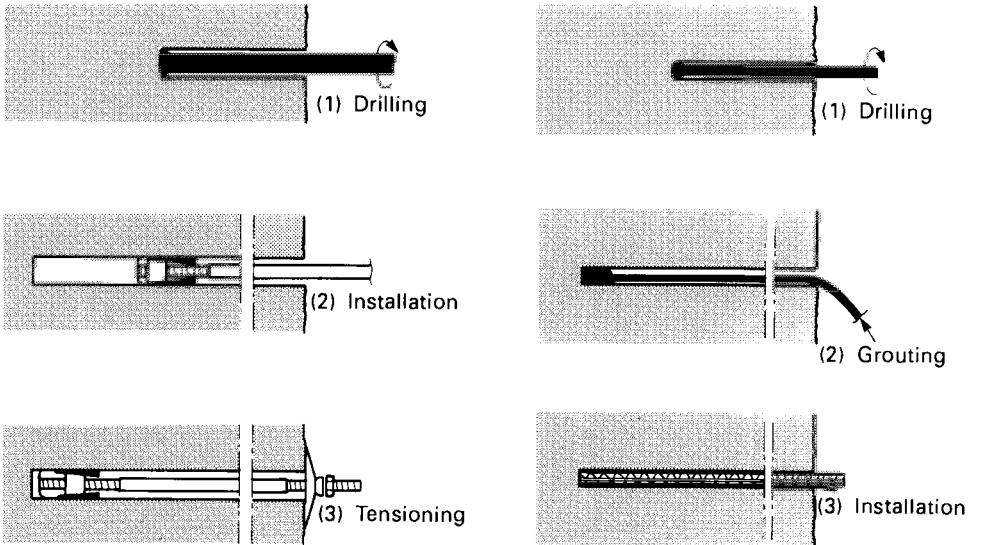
The principle for installation of tensioned expansion bolts (left) and untensioned grouted bolts (right)
